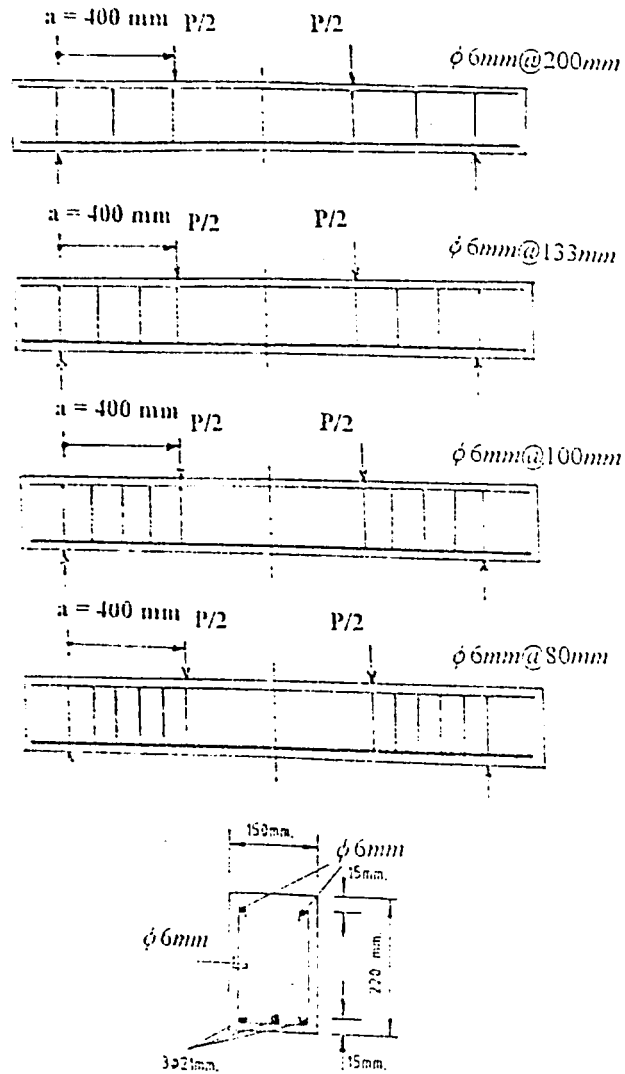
Four-point loading on heavily under-reinforced concrete beams with different spacings between stirrups
